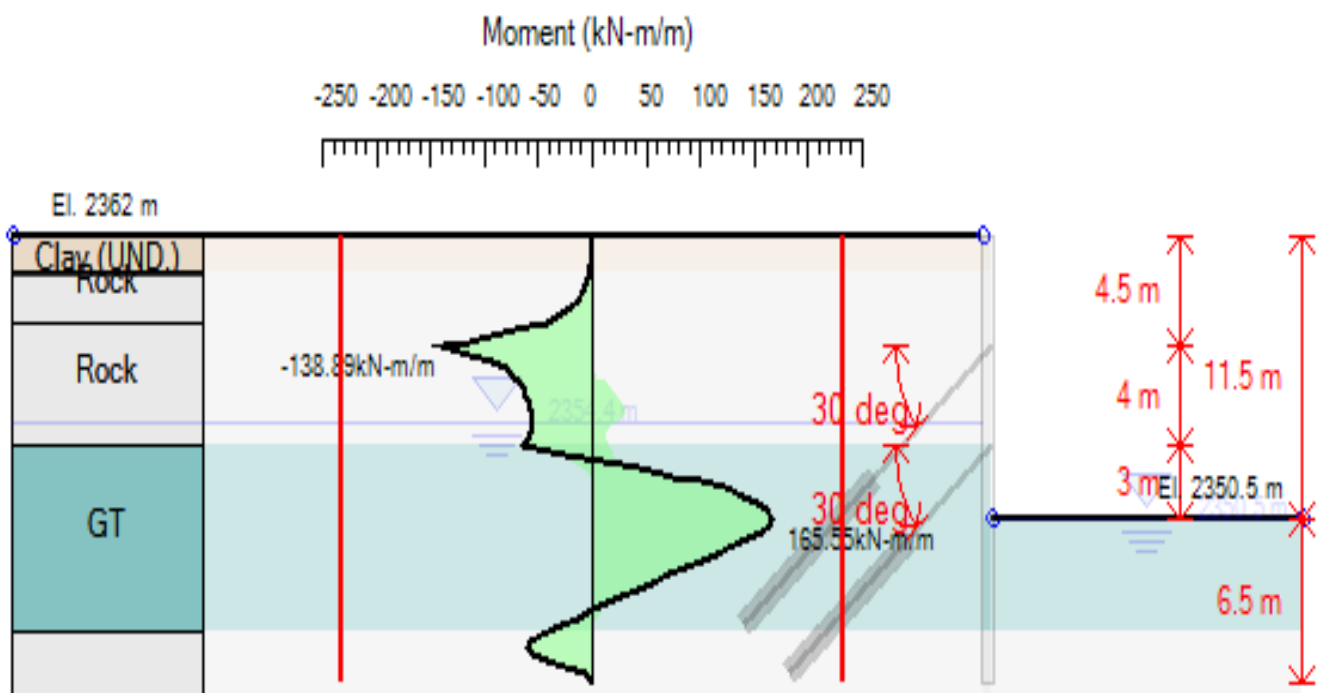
wall bending moment and moment capacity for 1.8 m and 4.5 m first anchor level
